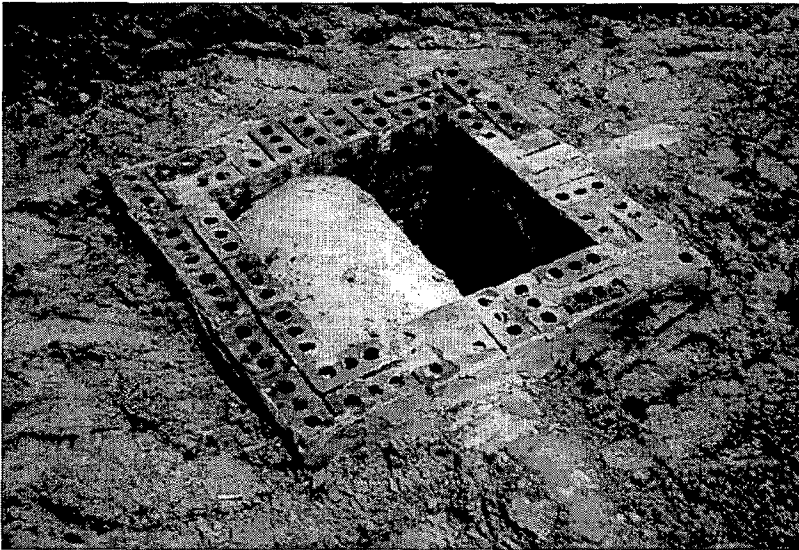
(b). Brick walls of the diversion manhole were erected. The existing pipe was cut open and the diversion weir constructed at the latter stages of the project. The pipe opening shown leads to the Carbon/Sand Filter.
